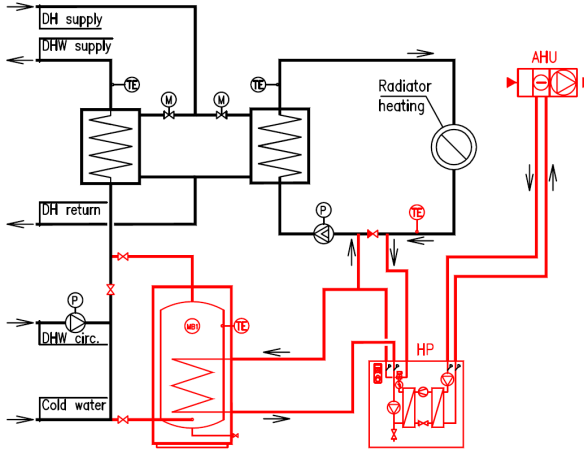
Principle scheme of heat substation with EAHP. The piping and equipment added to a conventional district heat substation have been drawn in red. Code: DH – district heating; DHW – domestic hot water; HP – heat pump; AHU – air handling unit.
